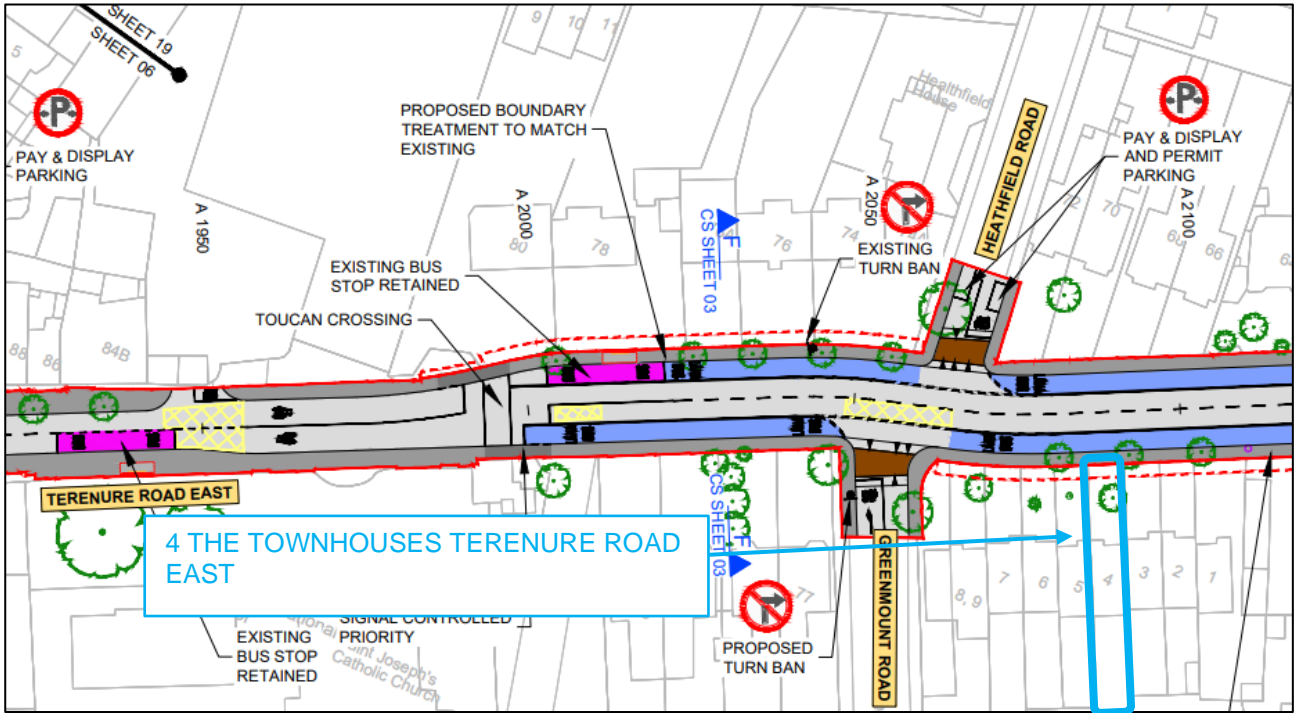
General Arrangement of Proposed Scheme adjacent to 4 The Townhouses Terenure Road East (Sheet 06)
